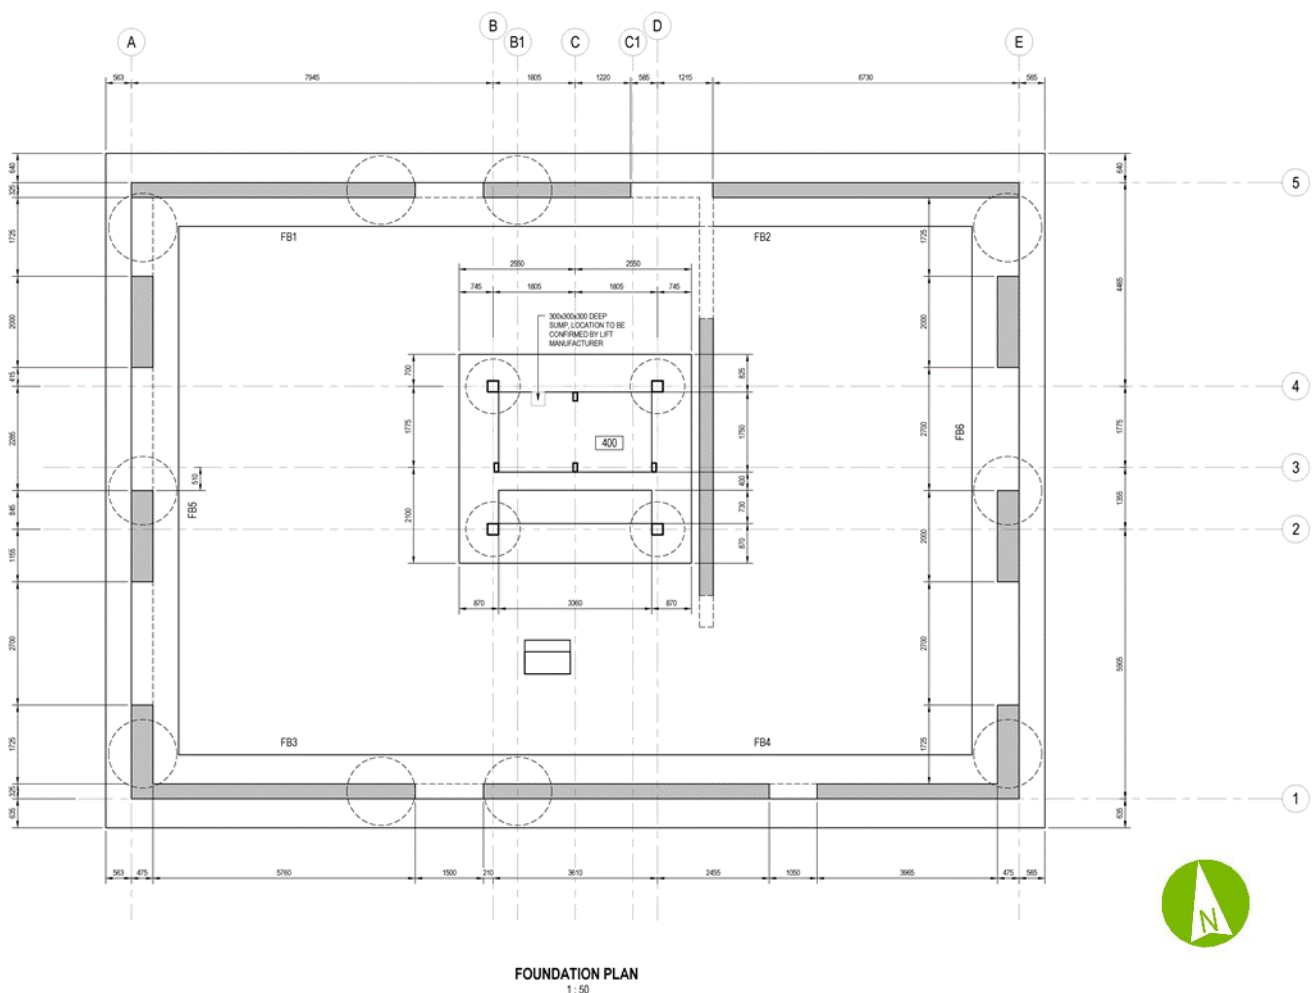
Plan of building foundations showing location of bored concrete belled piles.
